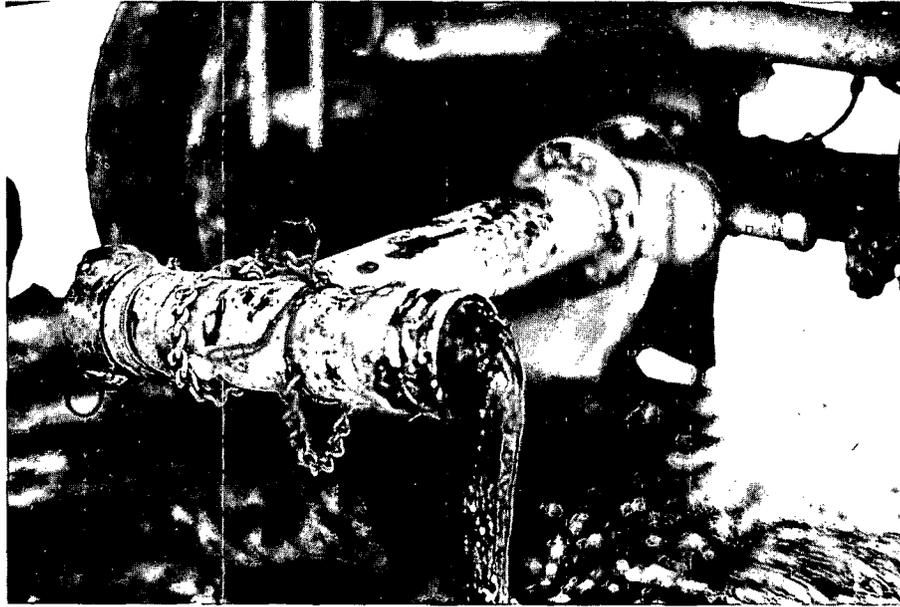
Defective Asphalt Emulsion Draining Out of Tanker
